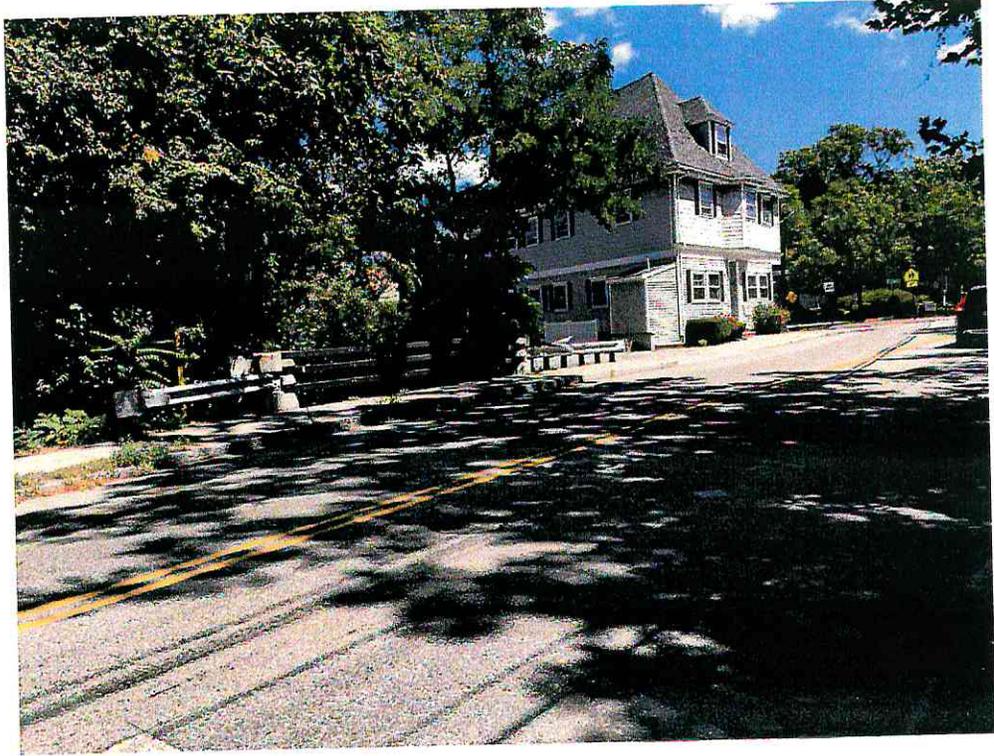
Location "River 1" – Cross St. looking east. 115' west of Forest St.
